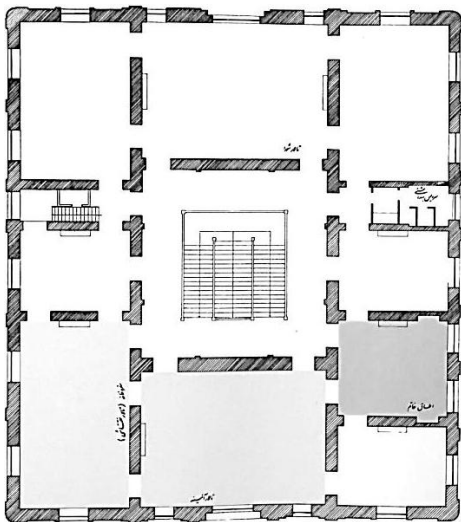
The First Floor Plan of the Marmar Palace, 1999.
